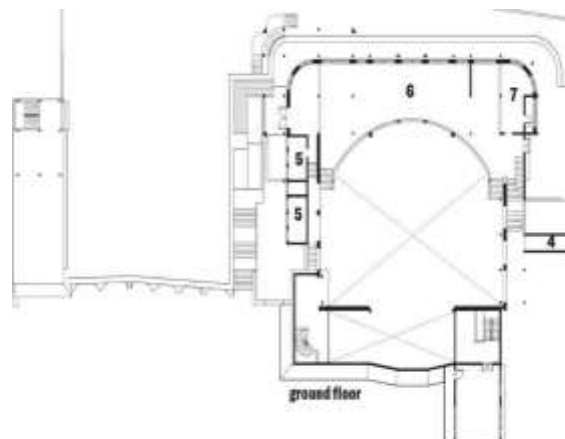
Ground Floor plan of the New Culture Centre, Mokola (Source: Author, 2025).
